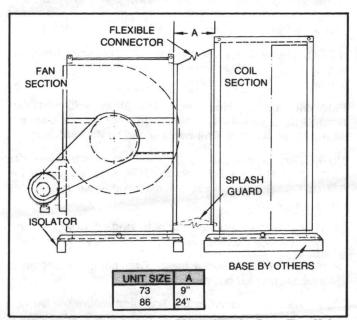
Mounting Clearance Dimensions for Draw-Thru Units Sizes 73-86
